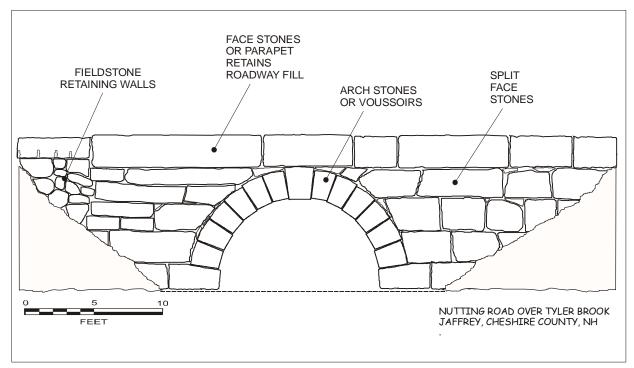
Typical stone arch culvert with semi-circular arch of split and cut granite quarry stone.
